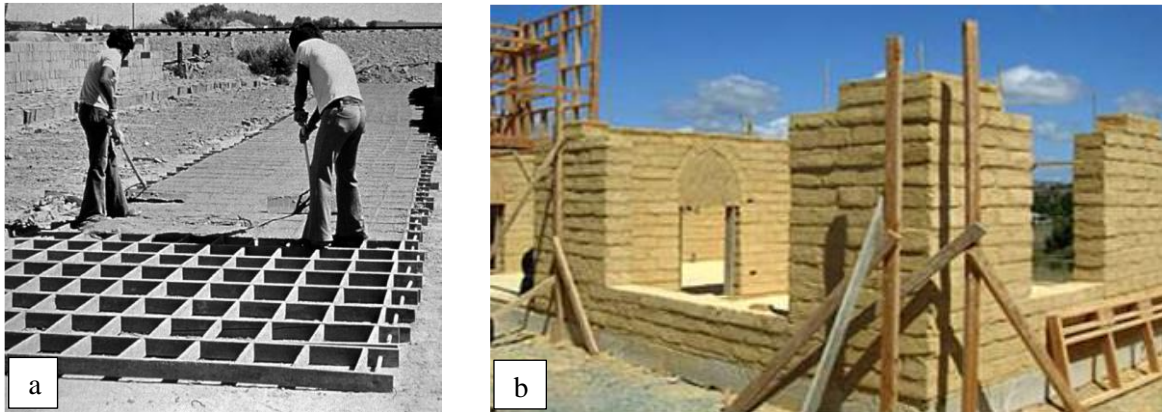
(a) adobe bricks manufacture process (b) house construction using adobe bricks
